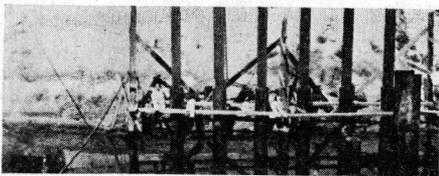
Steel H. Piles in Tubes. Courtesy of Carnegie Illinois Steel Corp.
